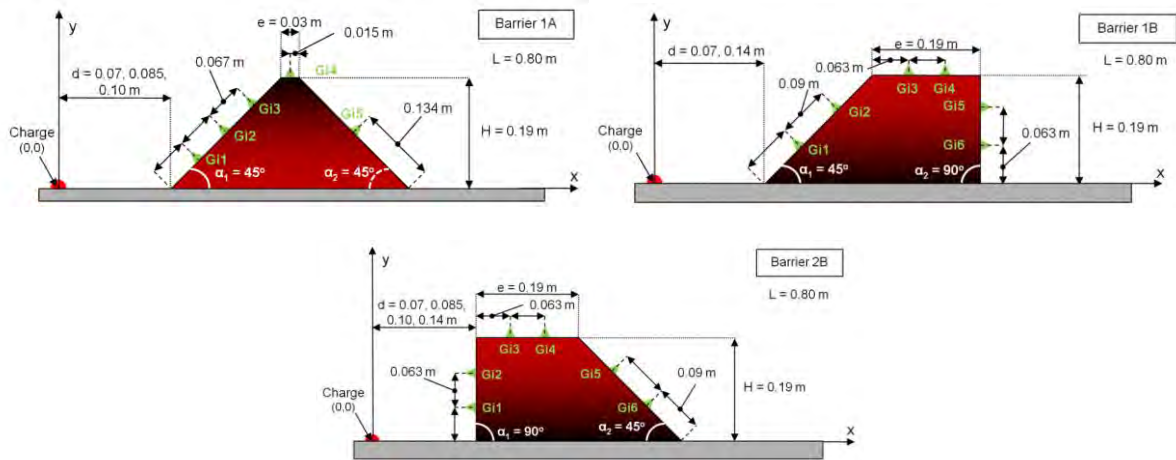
Example geometries for walls with trapezoidal cross-sections [23].
